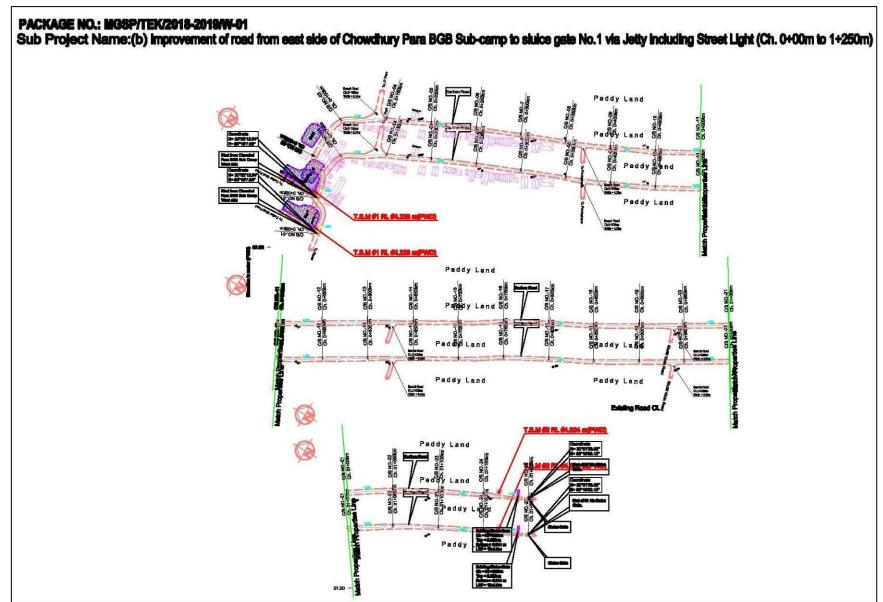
(b): Layout Plan for the proposed Subproject (b) East side of Chowdhury para BGB Sub-camp to sluice gate No.1 via Jetty road
